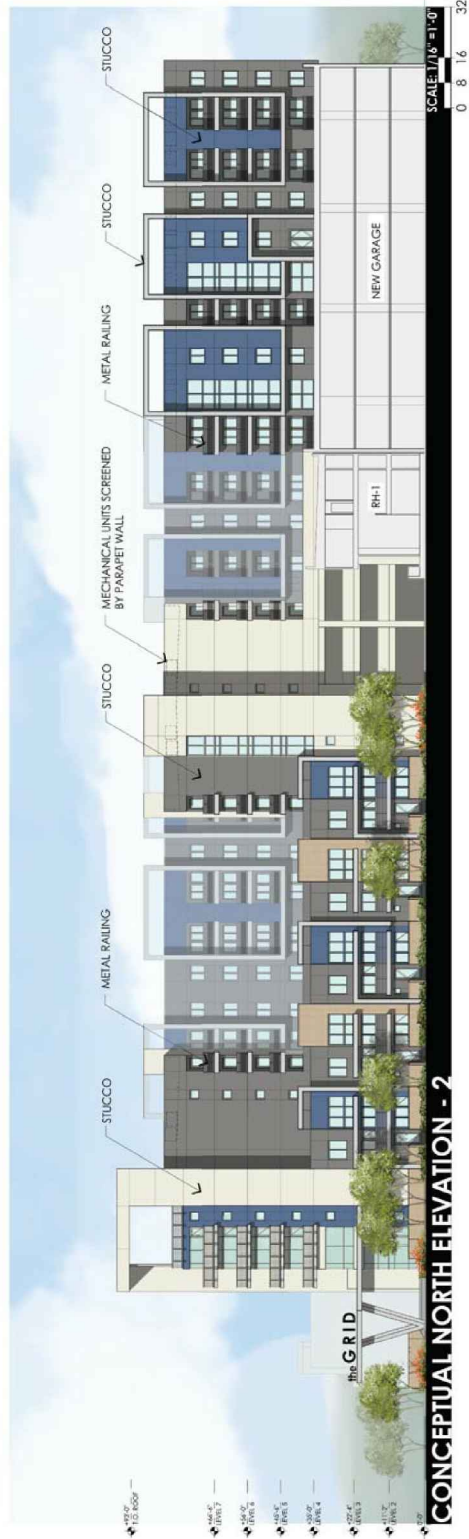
EXHIBIT D - PROJECT SITE PLAN, ELEVATIONS AND LANDSCAPING
